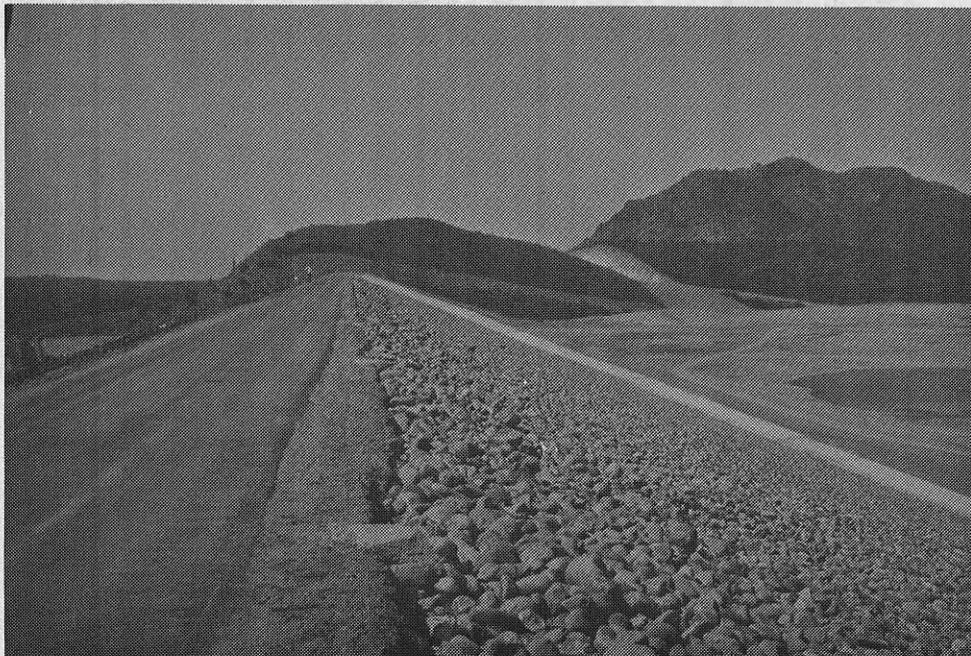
View of dam embankment crest, upstream face, and spillway from the east abutment. March 1985
